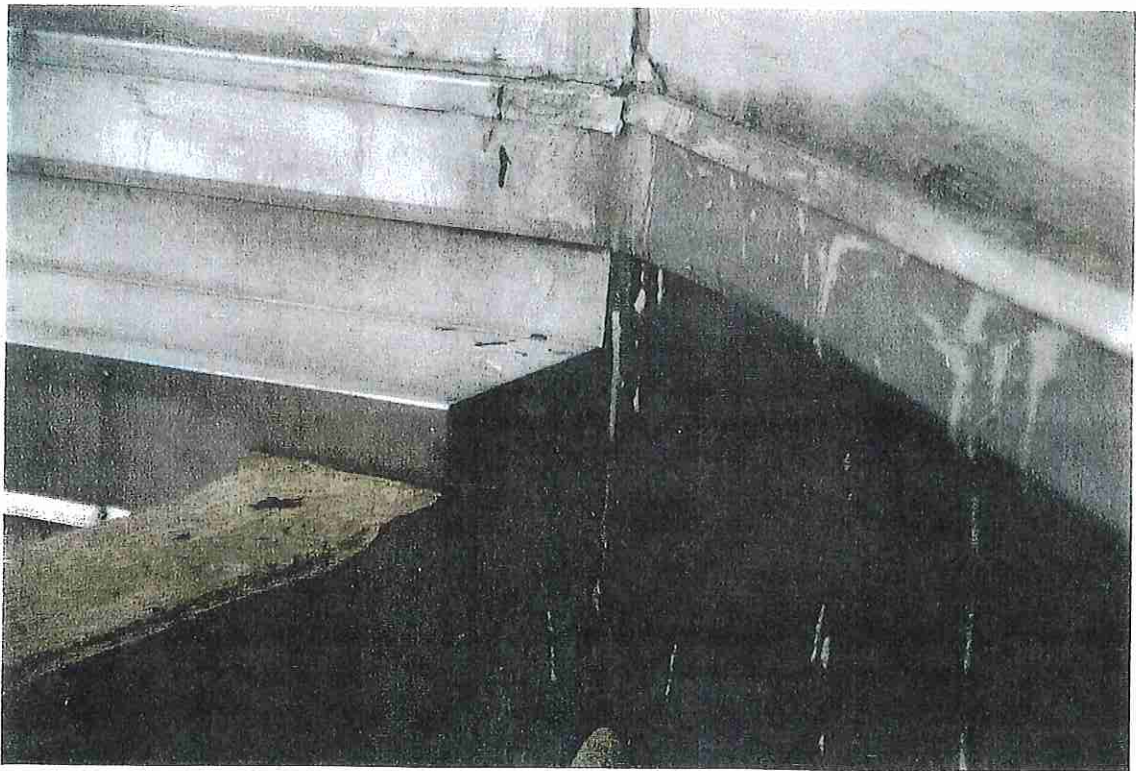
TERMINATION OF COUNTER FLASHING AT WINDOW WASHING PLATFORM -
